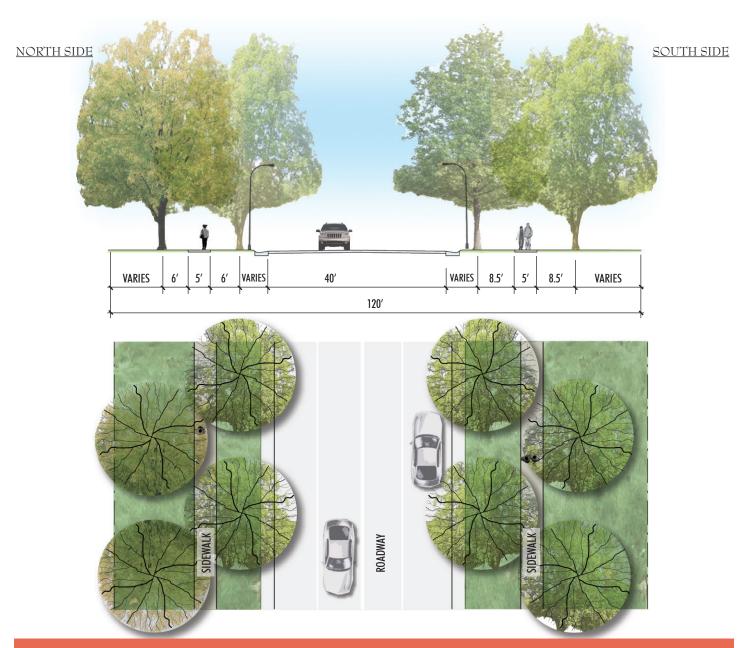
Eastern Parkway: Zone 4 Existing Conditions Section and Plan
